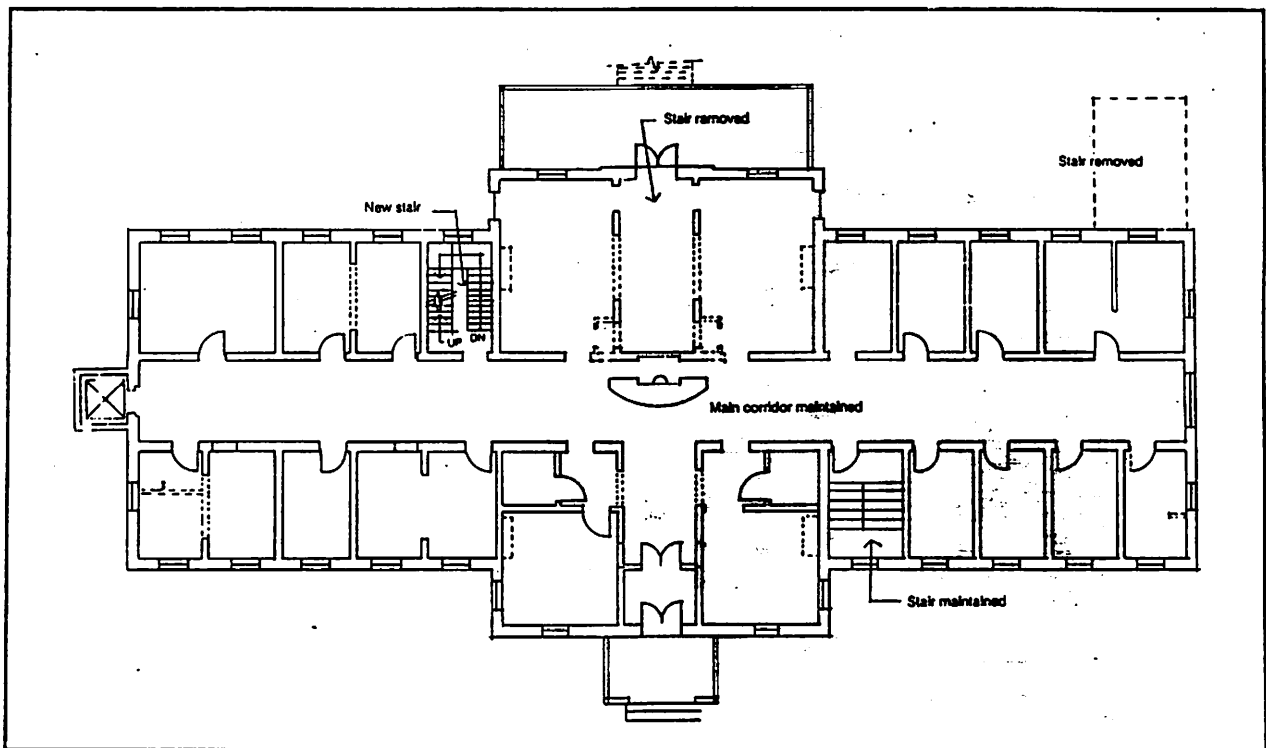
First-floor plan showing the final solution for retrofitting the building with stairs. The significant main corridor is retained.
